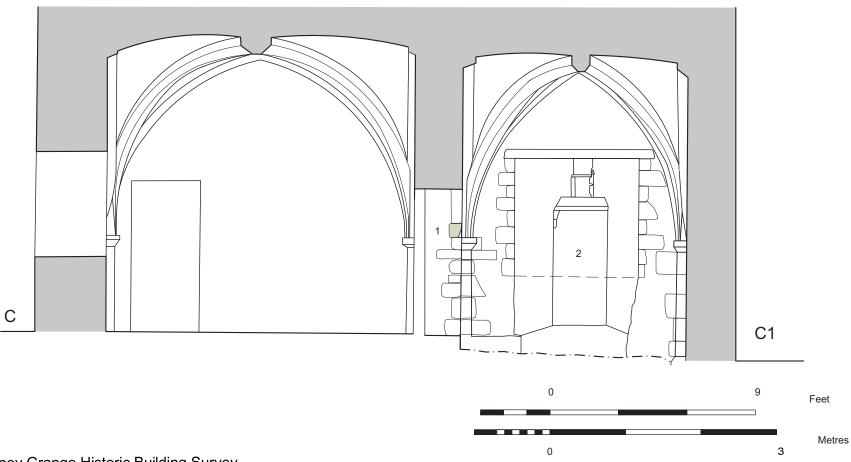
Sectional Elevation C-C1. West facing. Print Scale 1:50
